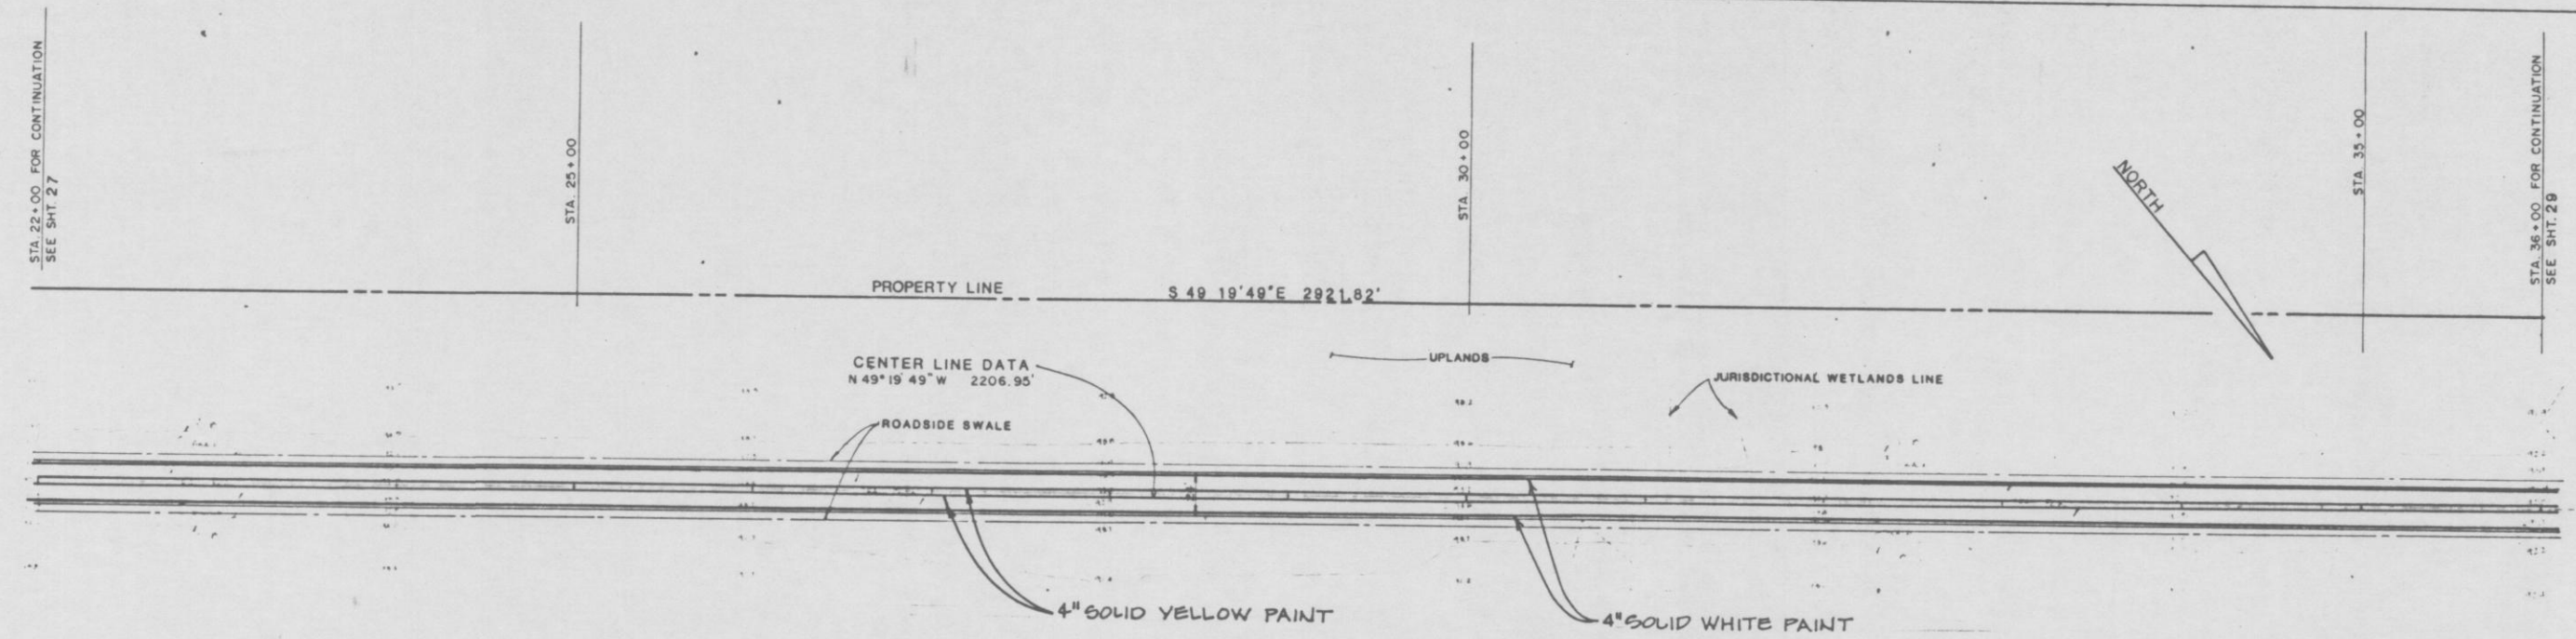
PLAN PROFILE OF A & E STANDARD
